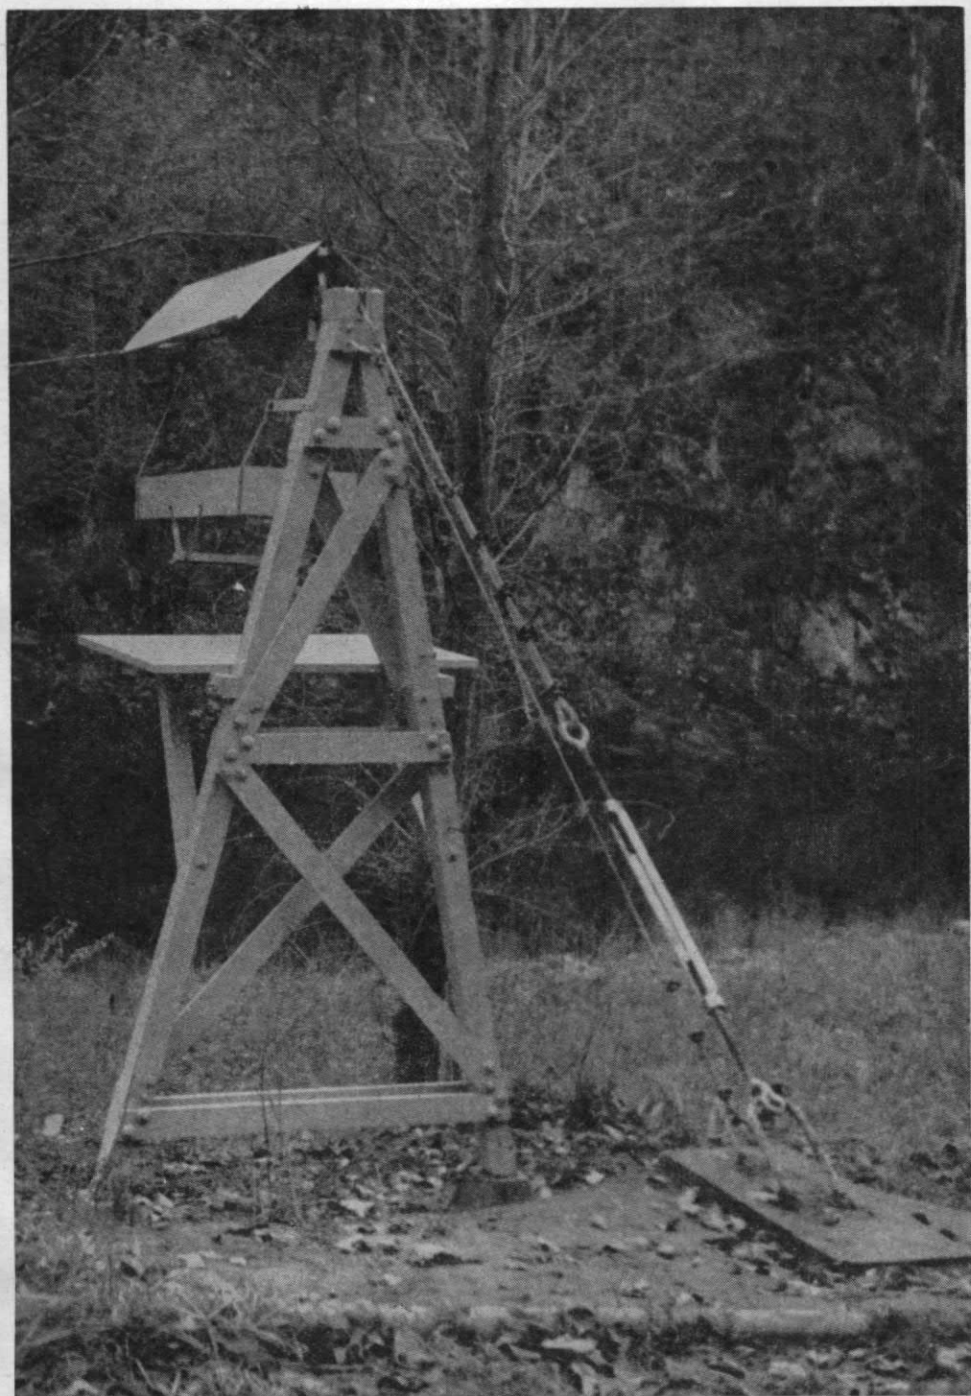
Typical wooden A-frame cable support, concrete anchorage and sitdown-type cable car. Baker River at Concrete.
